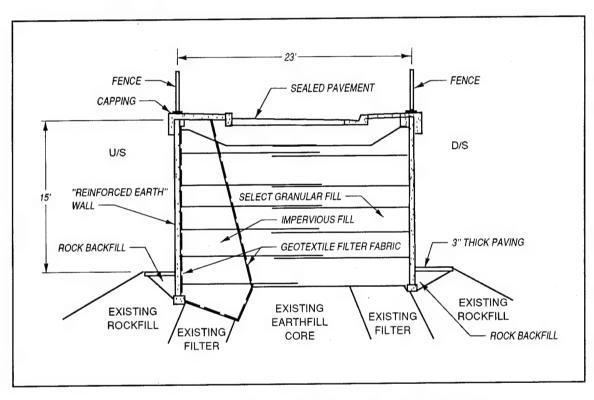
Typical section, Googong Dam modification (after Himsley 1991)
